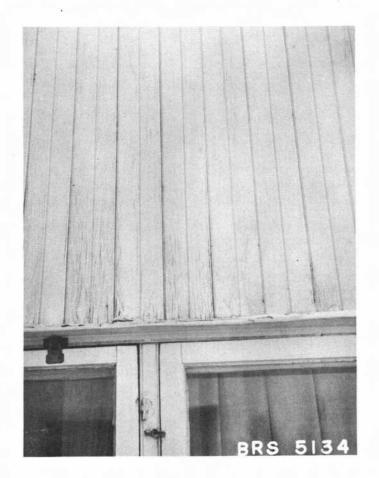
Wood panels at Cumberland Court, Cornwall, showing cracking and checking of paint and wood
